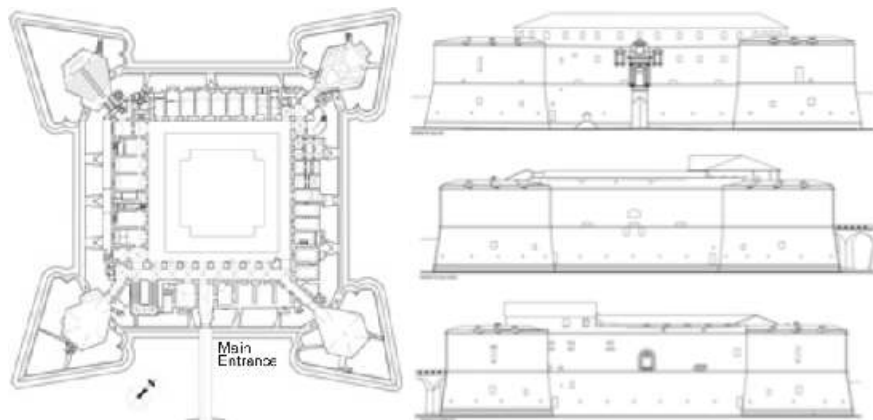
Geometric survey of the building: plan view (on the left) and elevations (on the right)
